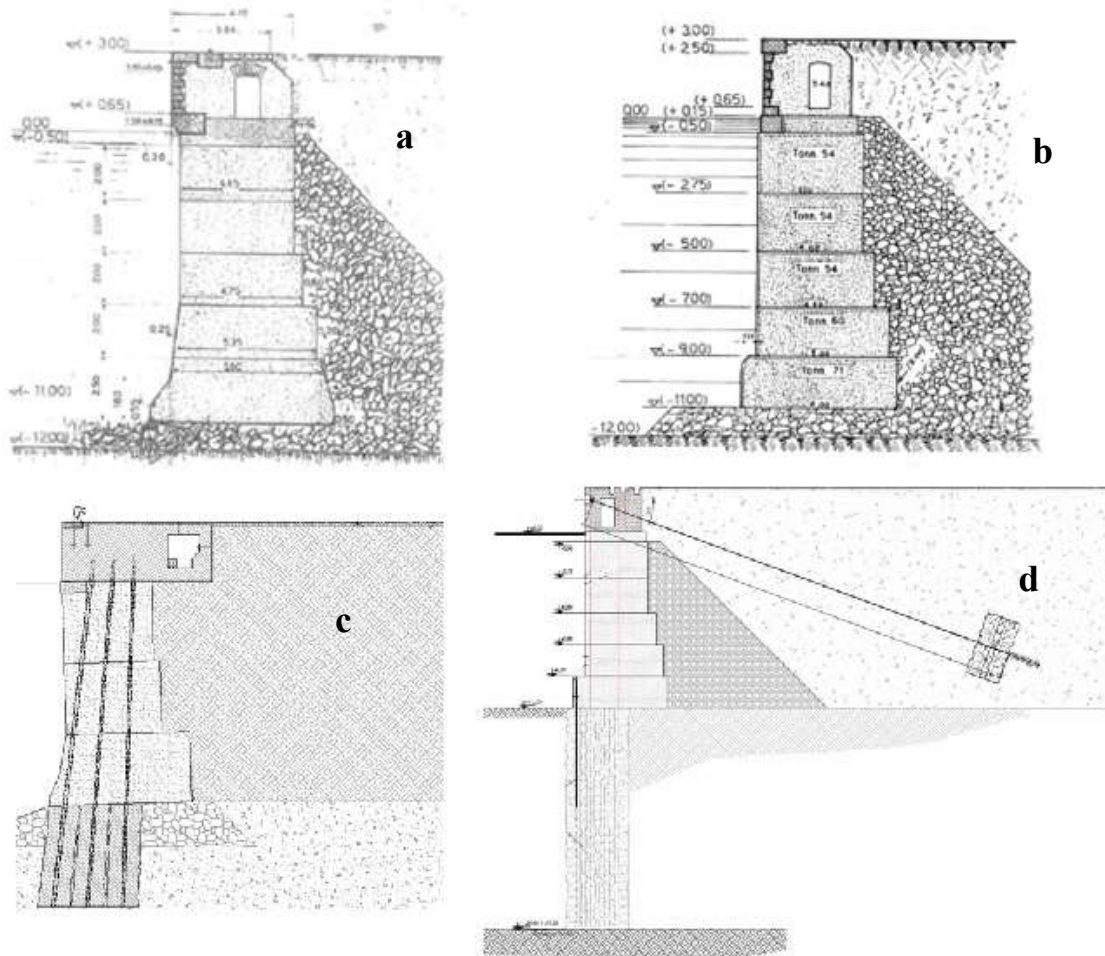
Examples of actual intervention of jet grouting. Eritrea Pier (a) and San Giorgio Pier (b) in Port of Genoa and the corresponding interventions (c) and (d)
